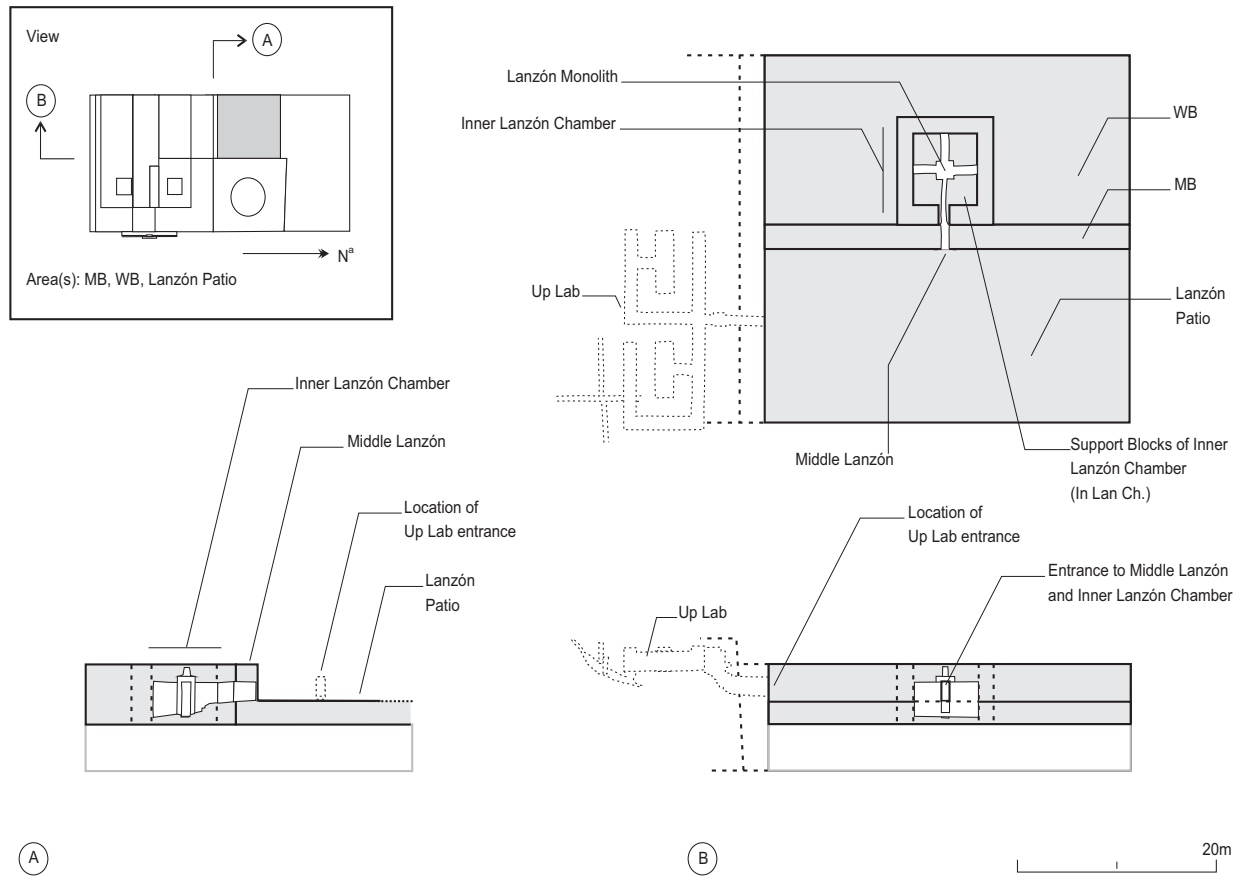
Building B Construction Phase 2: WB–MB Phase; plan and architectural north (A) and west (B) profile views.
